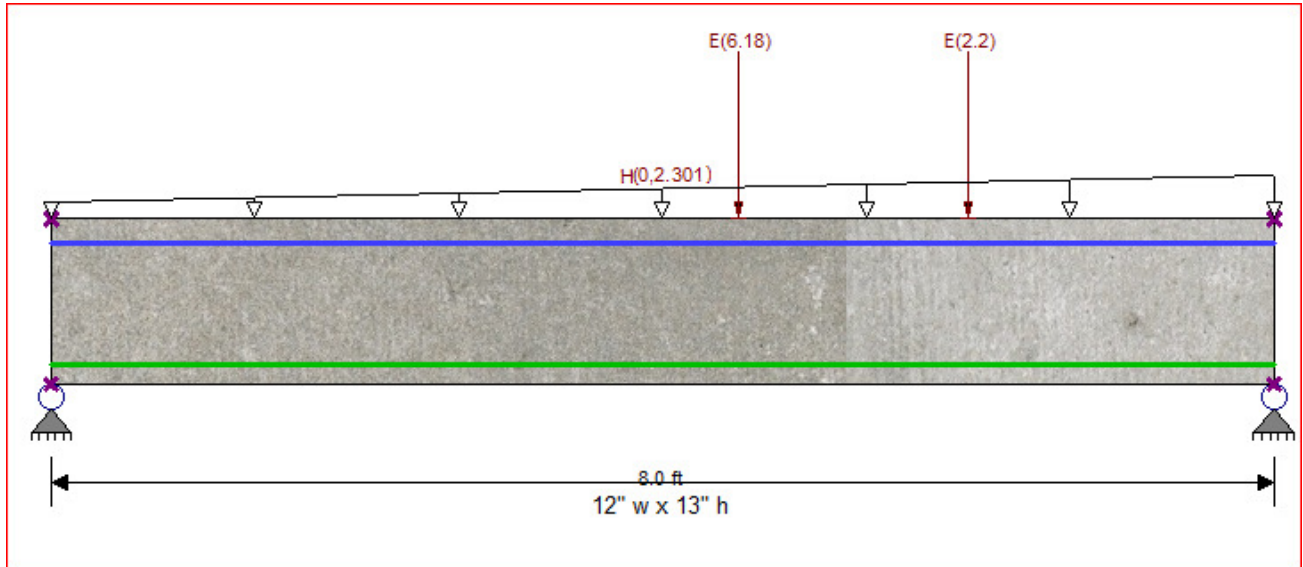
2D View of Ram Elements Design Model of Concrete Pool Wall
